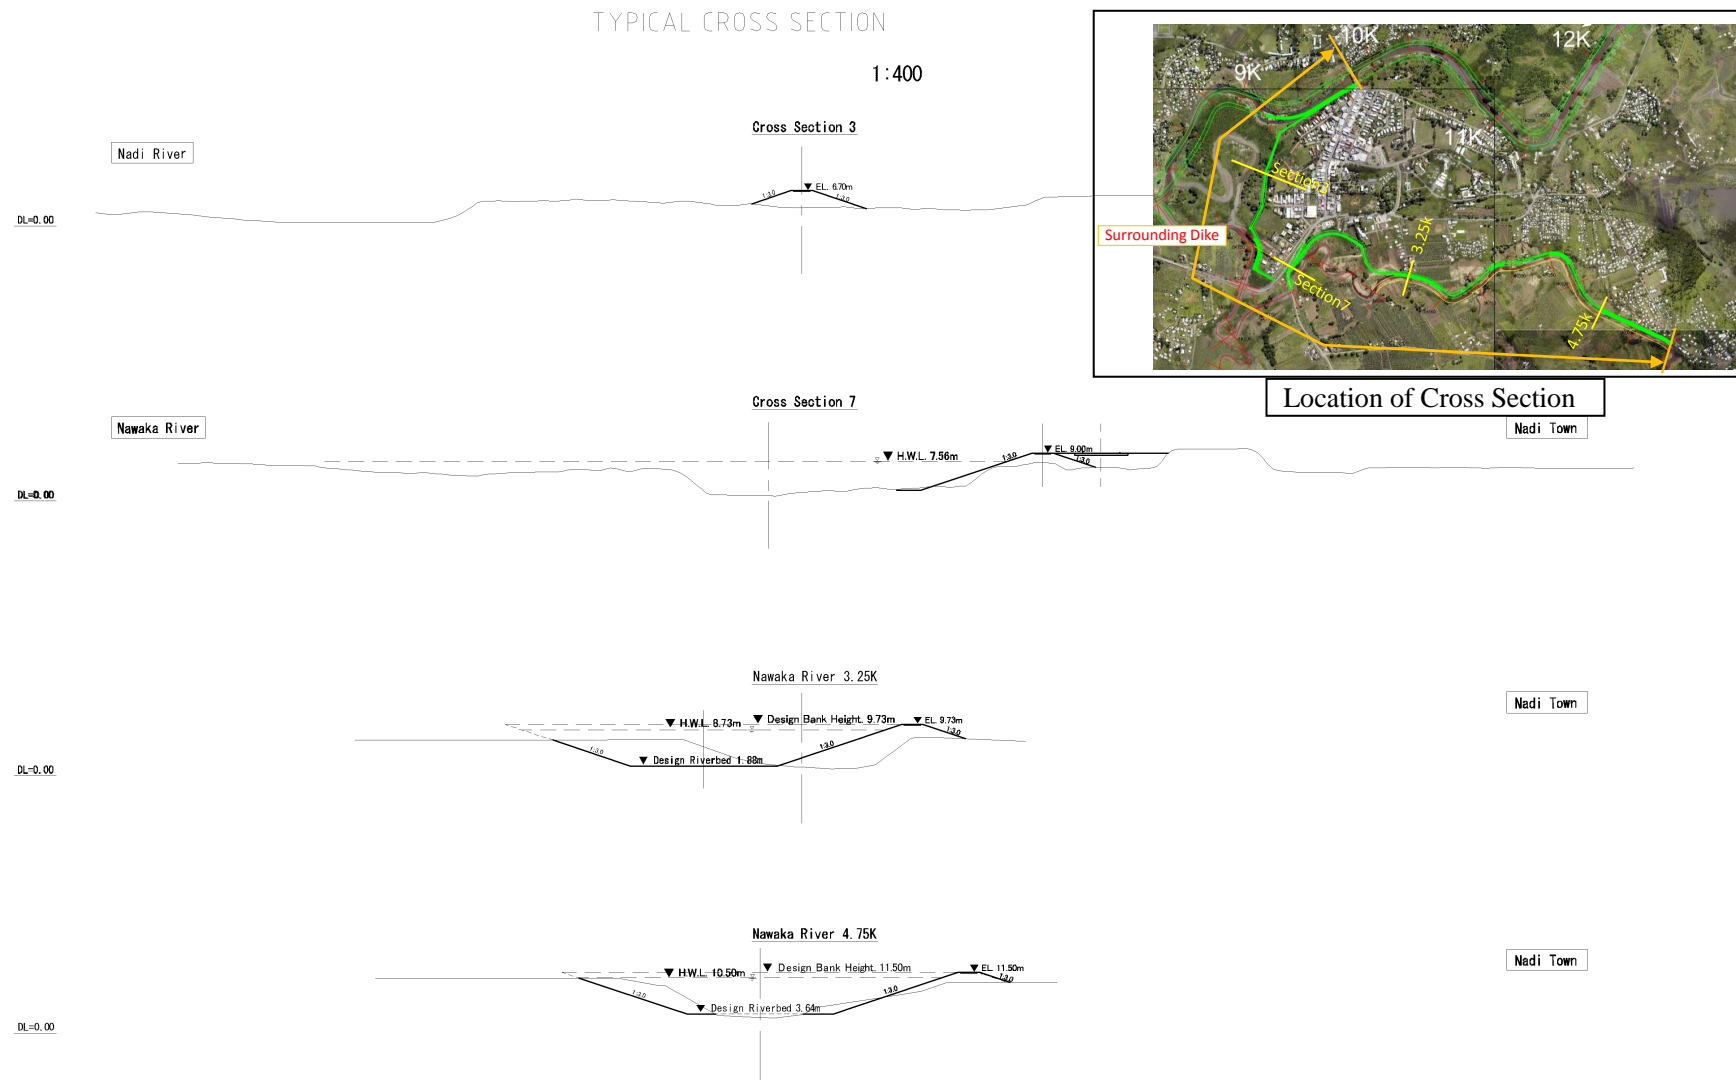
Typical Cross Section (Surrounding Dike of Nadi Town)
